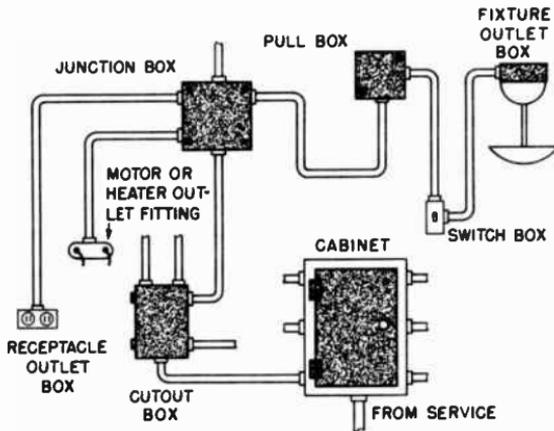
How rigid conduit is run from one box to another in an electrical wiring system.
